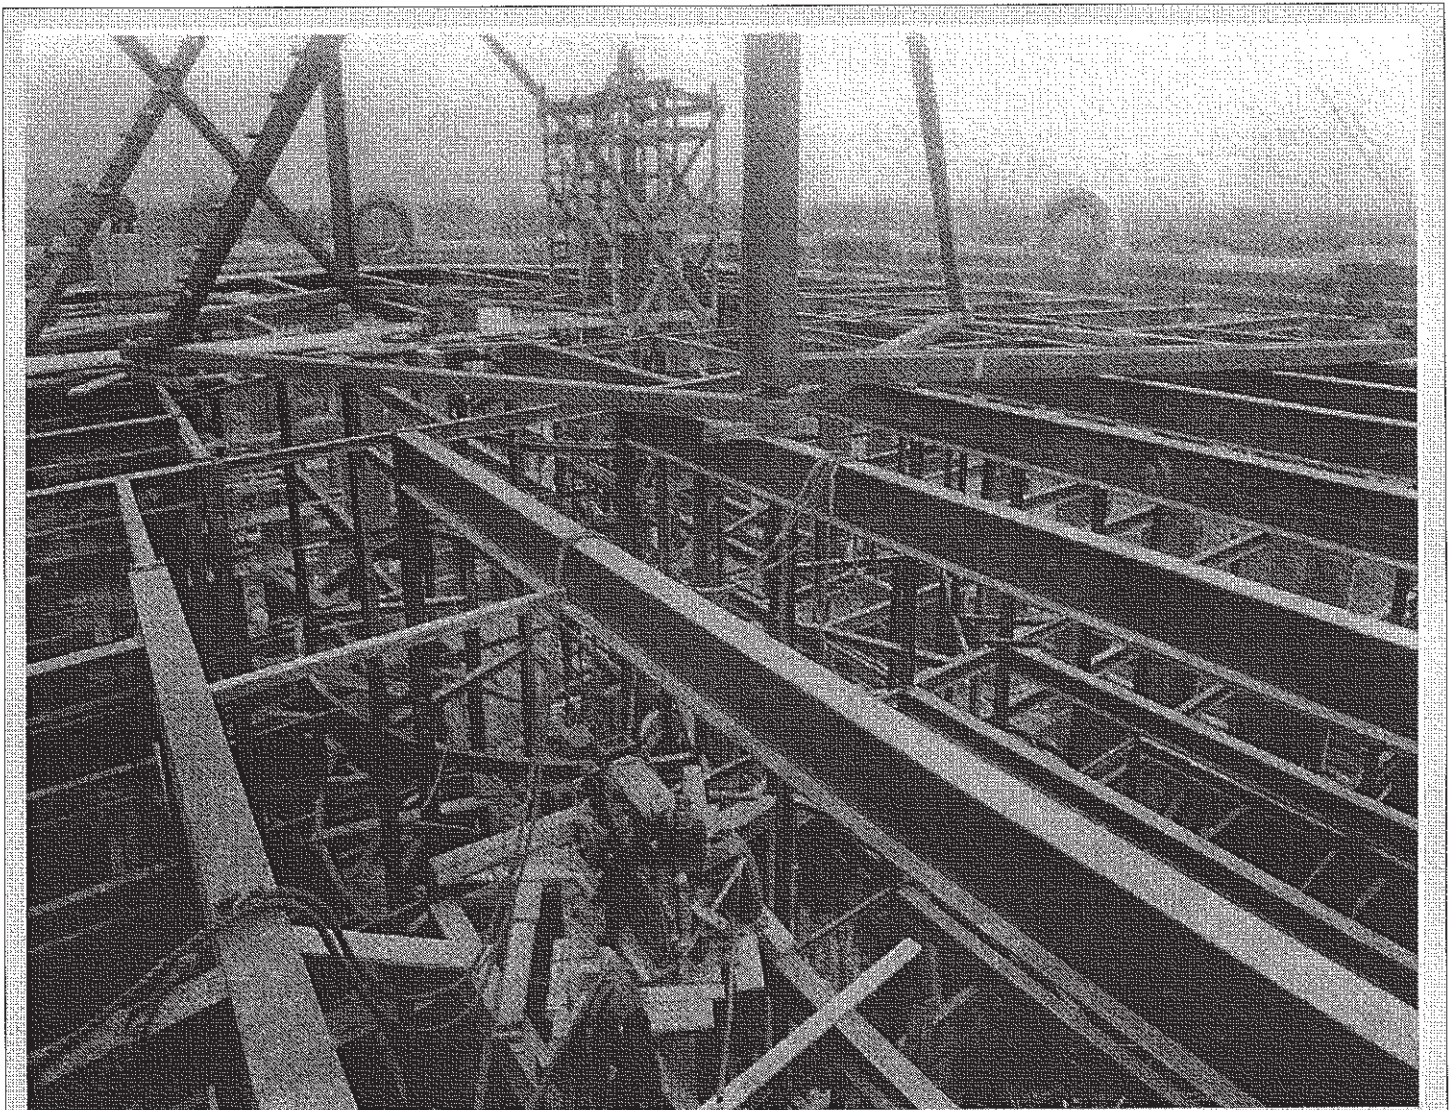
Sullivan County Courthouse under construction, c. 1926; structural framework as viewed from roof.
